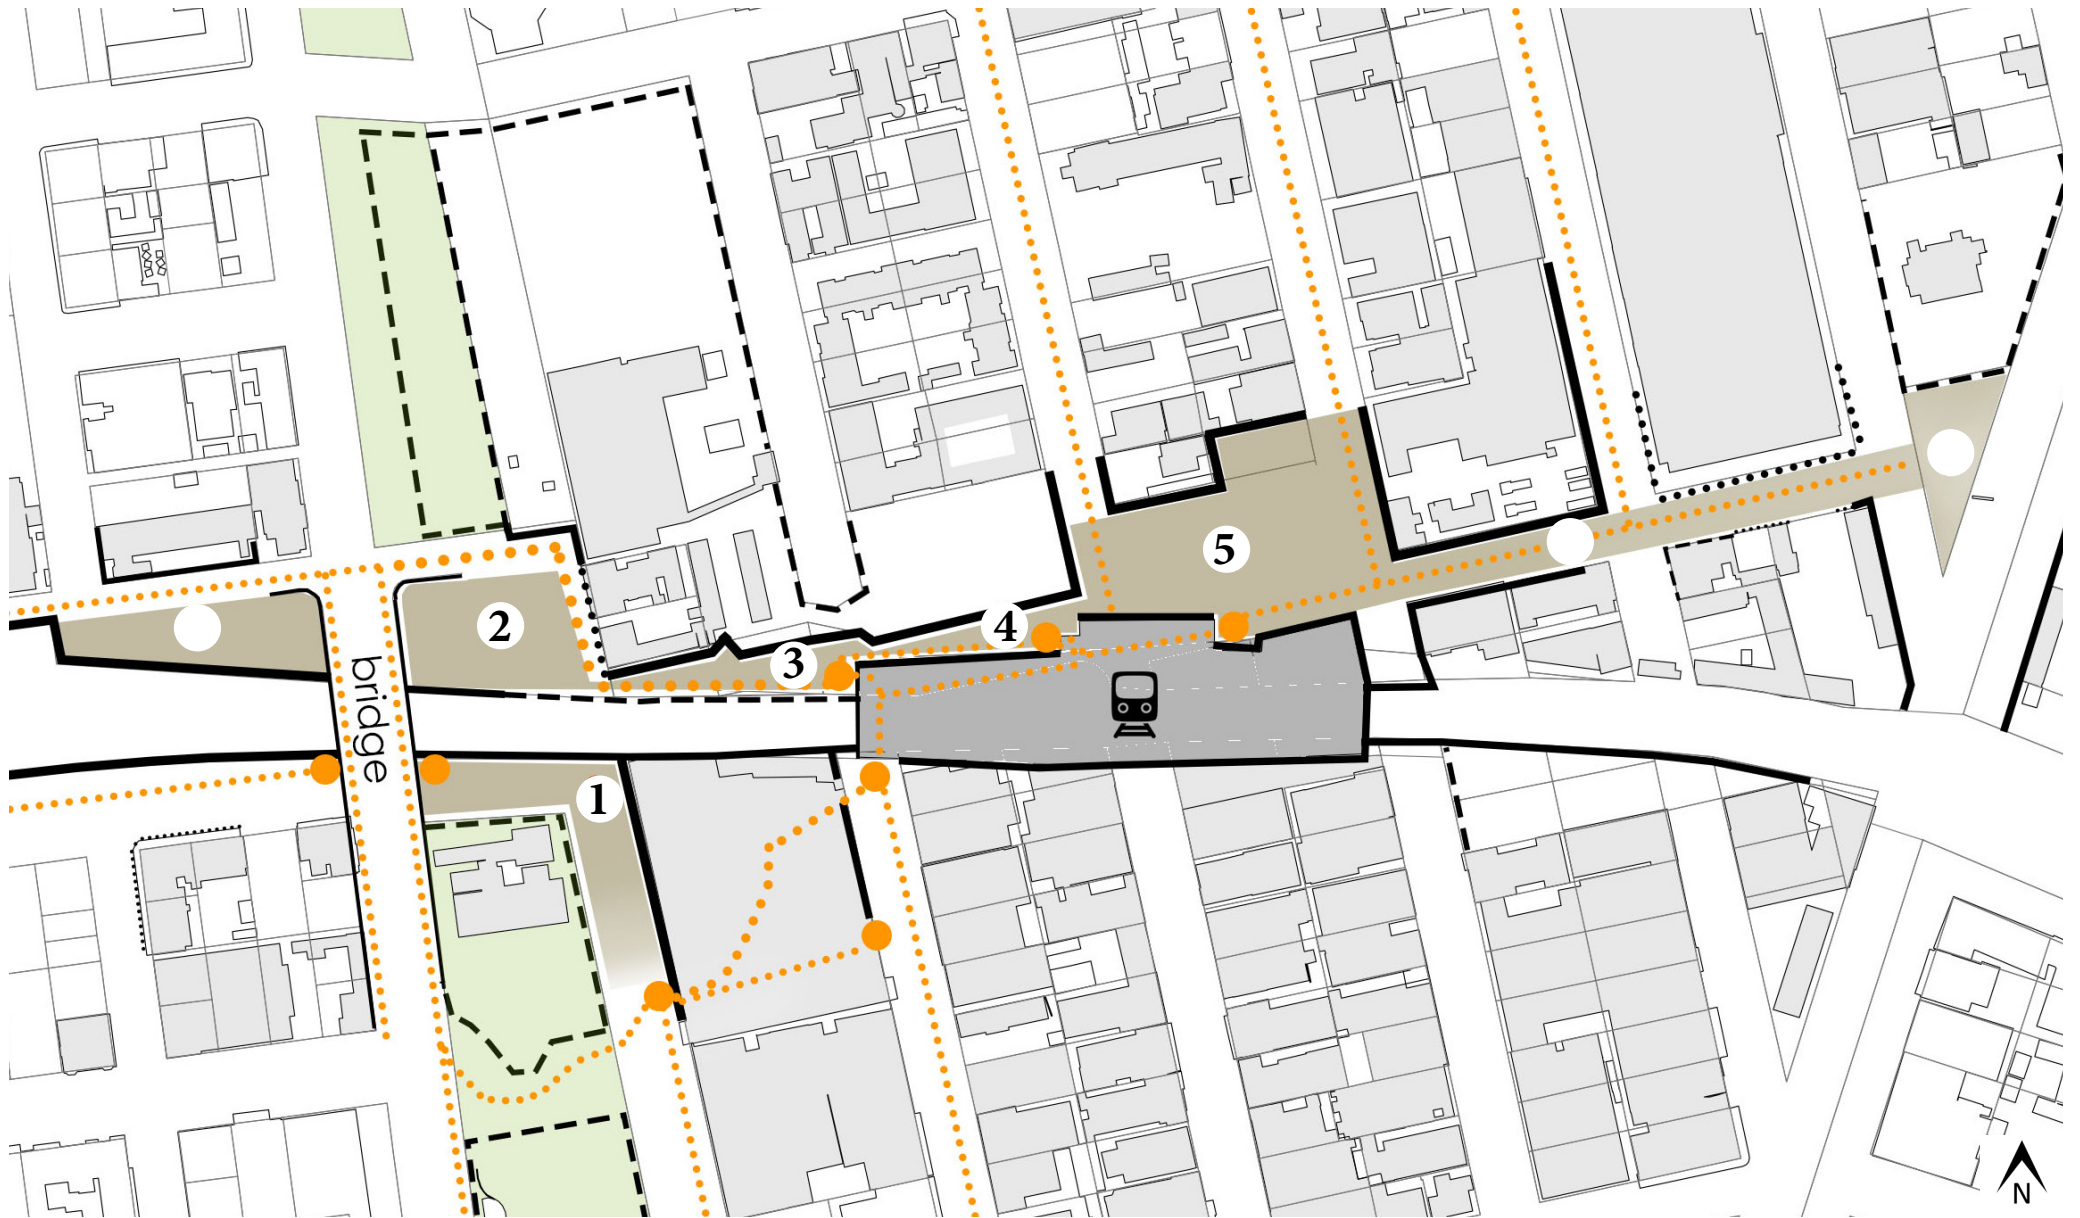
Site analyses - Plan view of identified lost spaces, movement and access points (Author, 2019)
